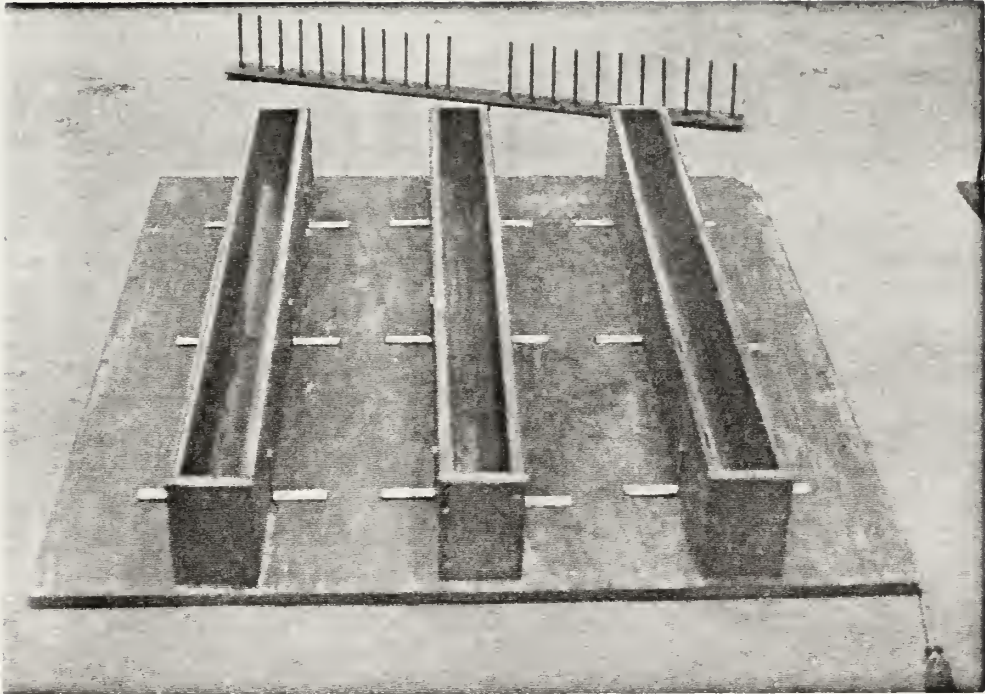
Formwork for all the Beams and Steel Cage for Beam I.
